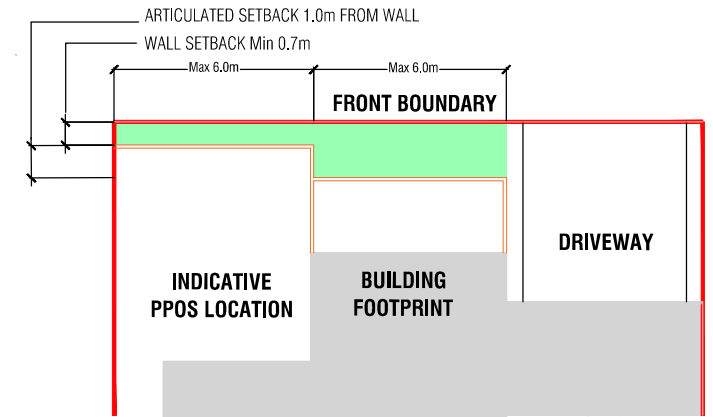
EXAMPLE - COURTYARD WALL, SHOWING ARTICULATED PLANTING ZONE SETBACK
